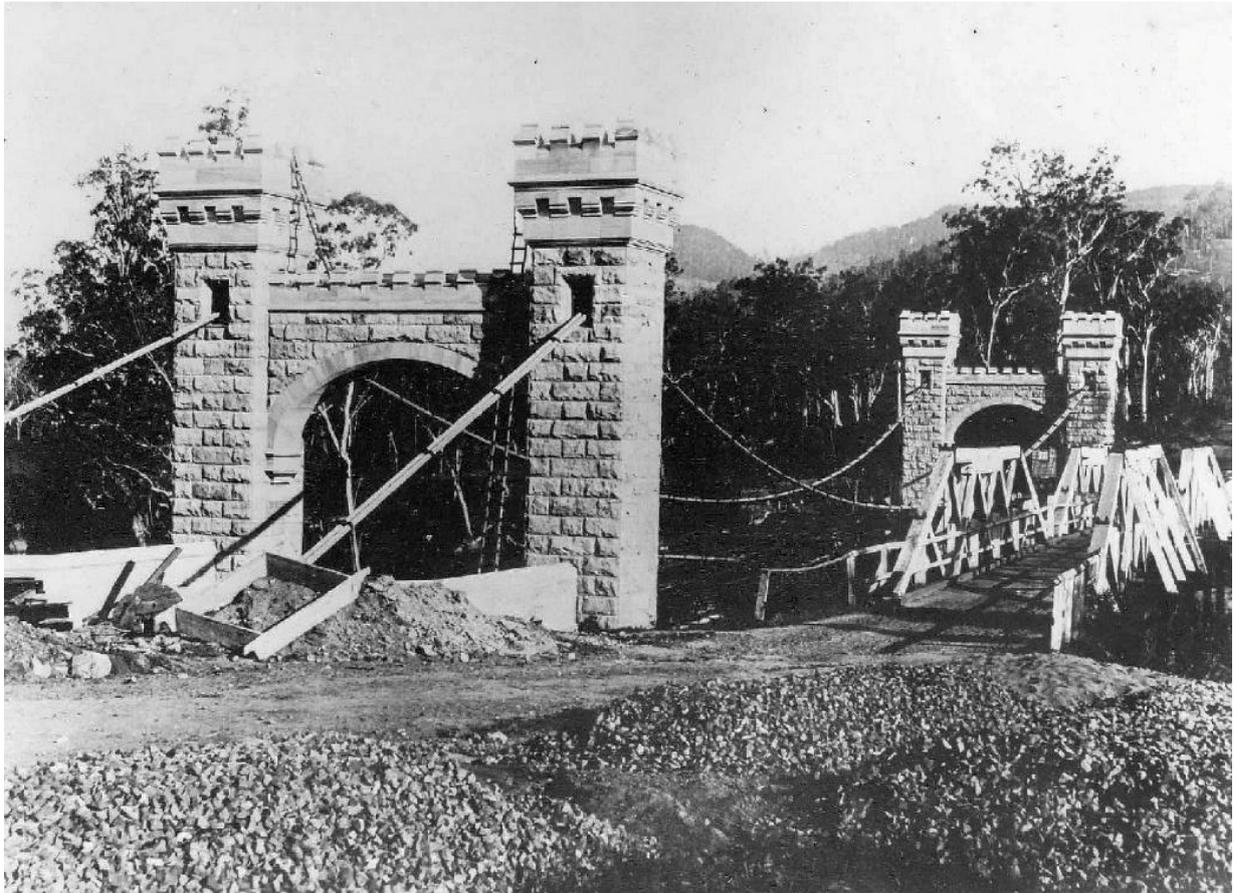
A Rare Photo of Hampden Bridge being constructed with the Original Bridge (soon to be washed away) alongside c 1897
